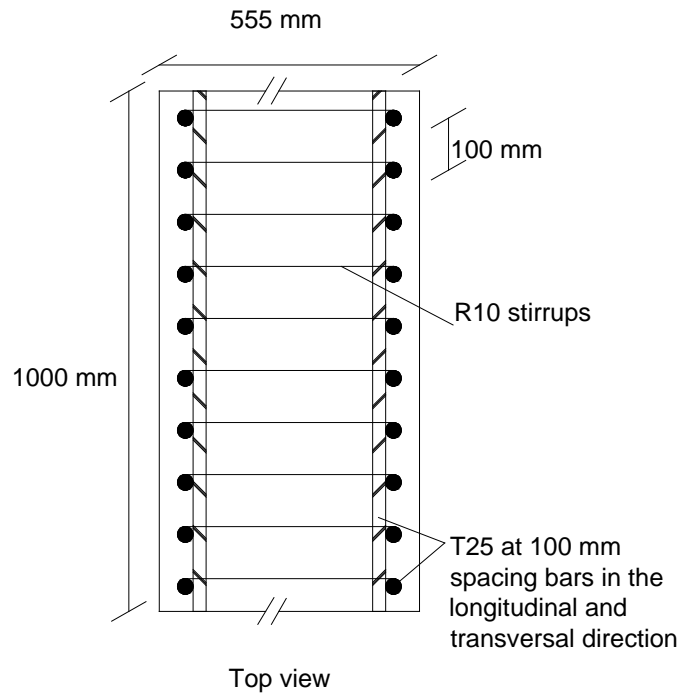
Reinforcement detail in the concrete blast wall designed to resist blast loading of 250 kg TNT at a 5 m standoff distance.
